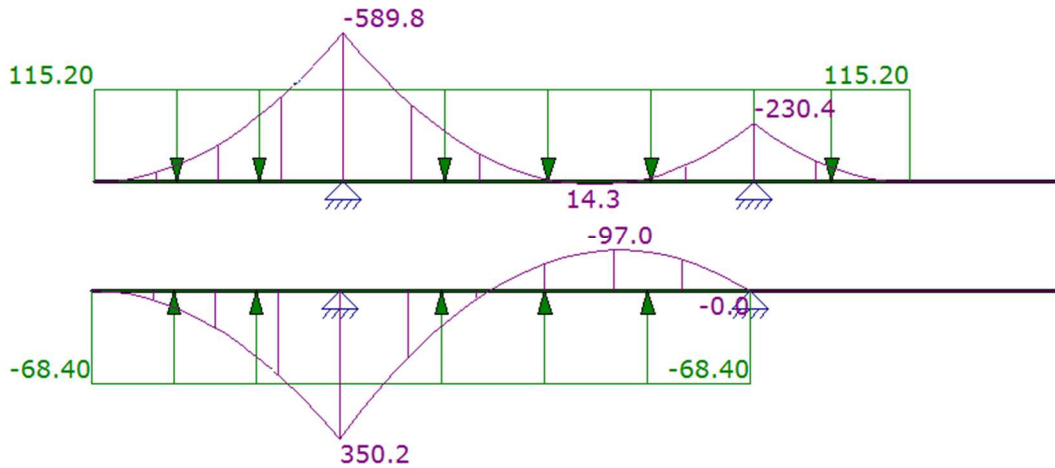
Moment distribution transverse girder; storm surge (upper) and salt intrusion (lower)
